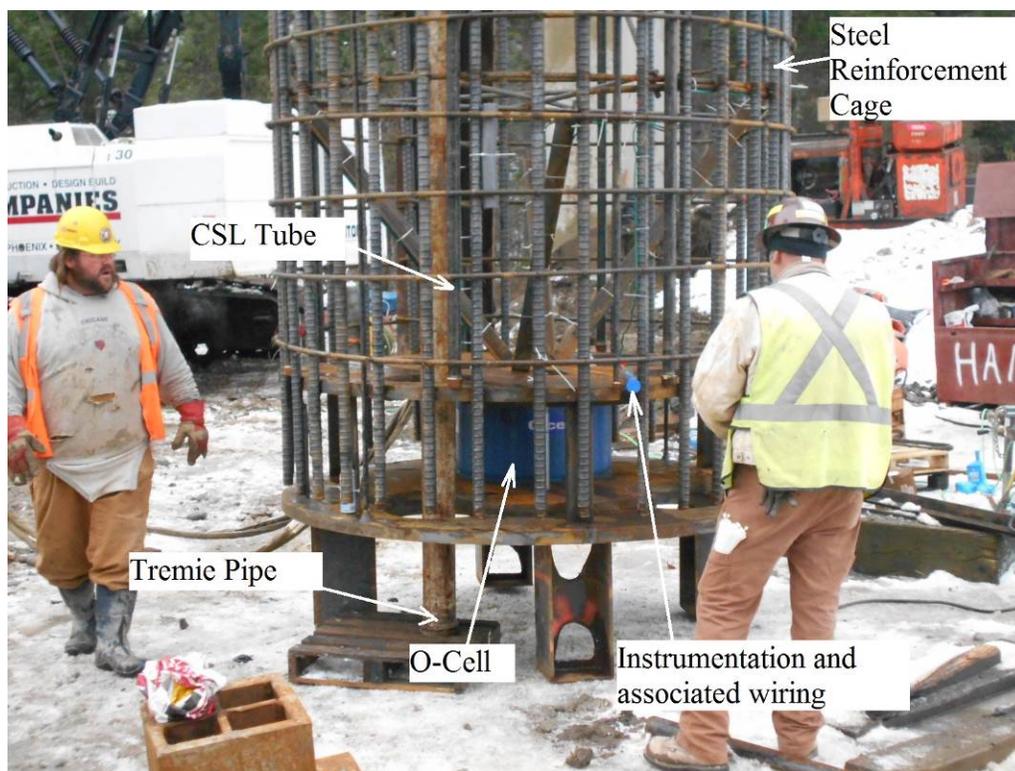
Setting the O-Cell into place on the bottom plate assembly
